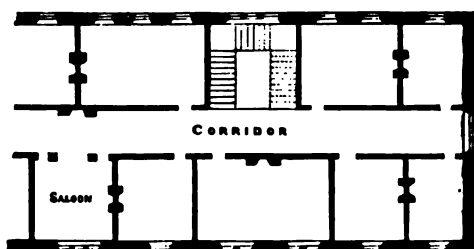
PLAN OF CORRIDOR WITH ROOMS ON BOTH SIDES.
